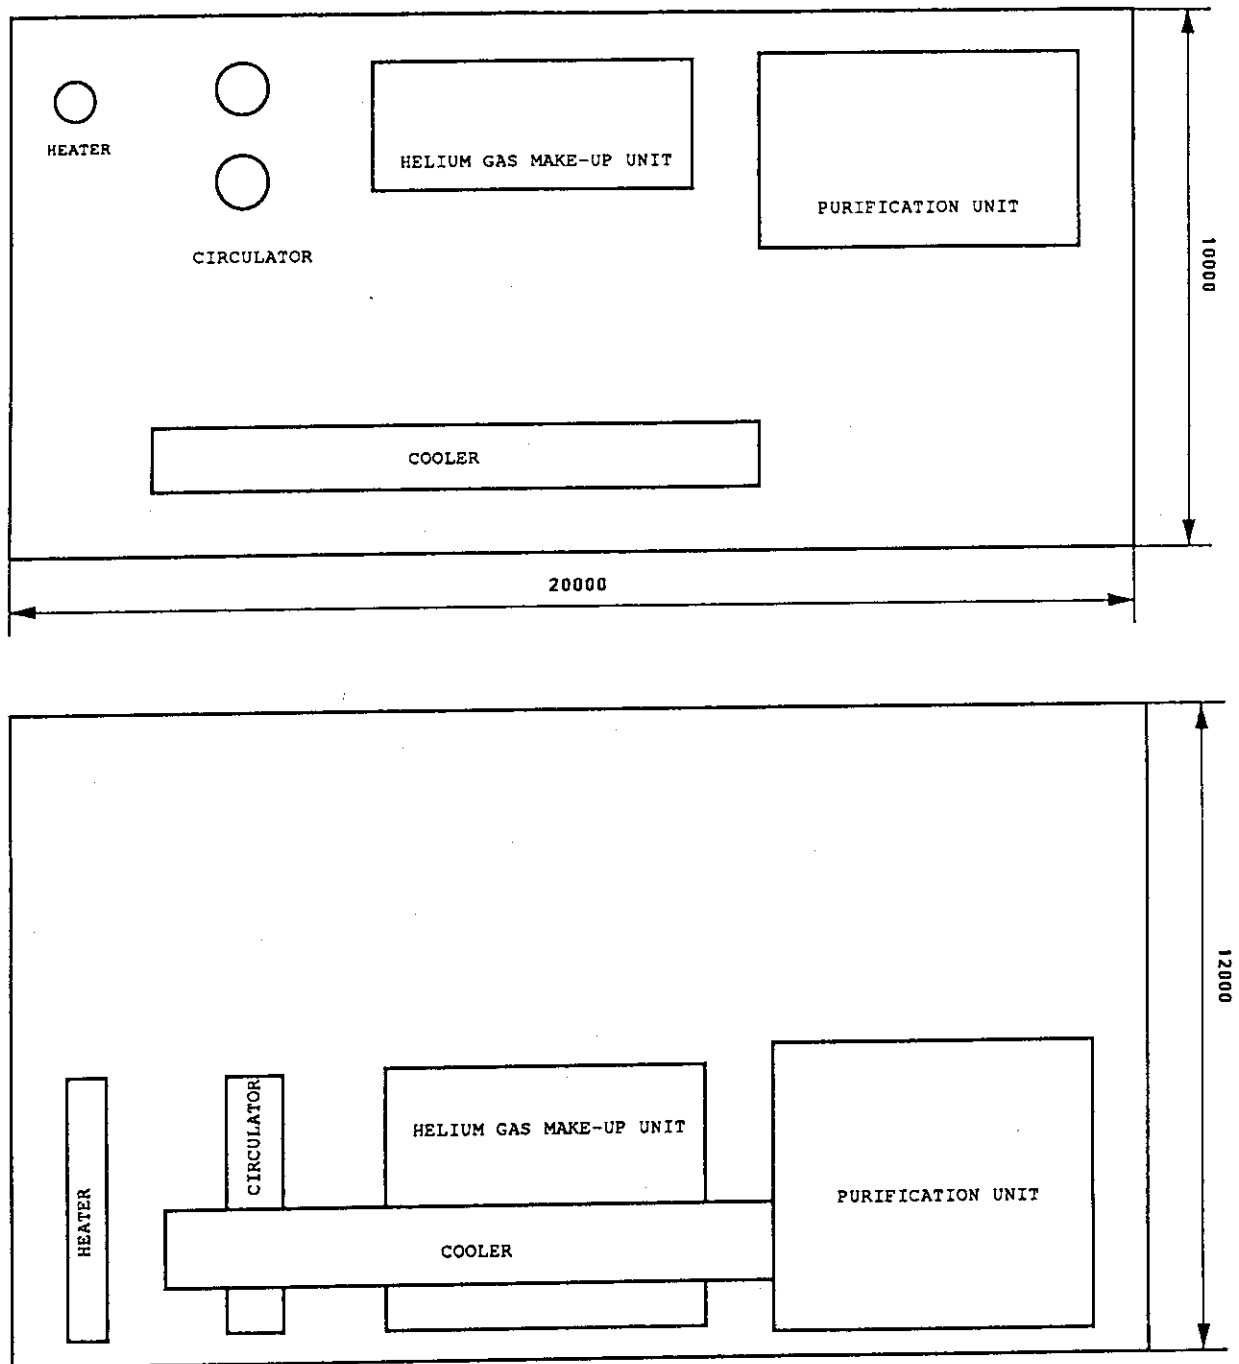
Layout plan of cooling system for helium-cooled test module
